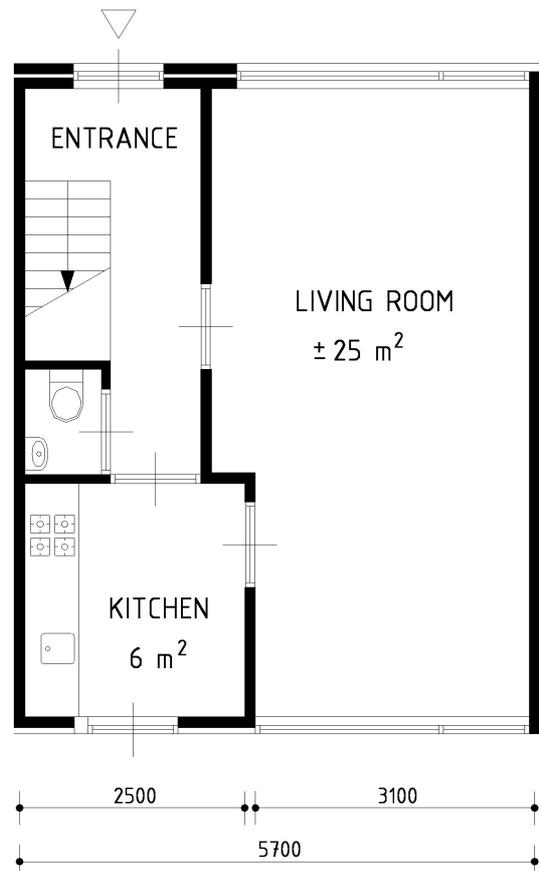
Ground floor plan single family row housing built in the 1945 -1965 period.
